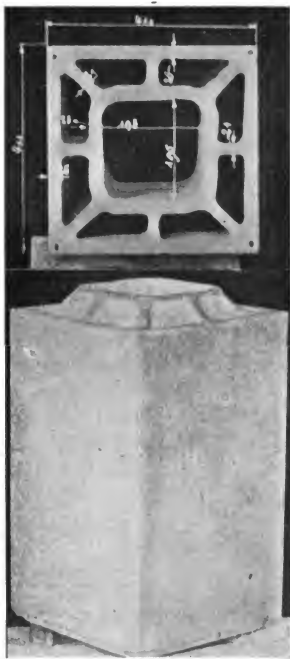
A CHIMNEY BLOCK IN ELEVATION AND SECTION.
